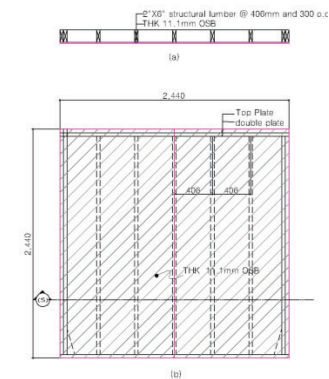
Schematic illustration of shear wall specimen (a) Section view of shear wall specimen, (b) Plan view of shear wall specimen
